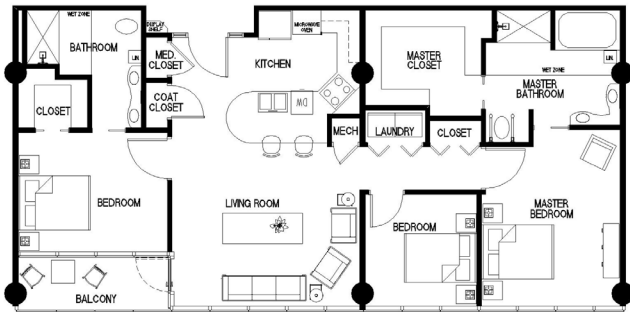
Floor Plan - 3 Bedroom Unit
